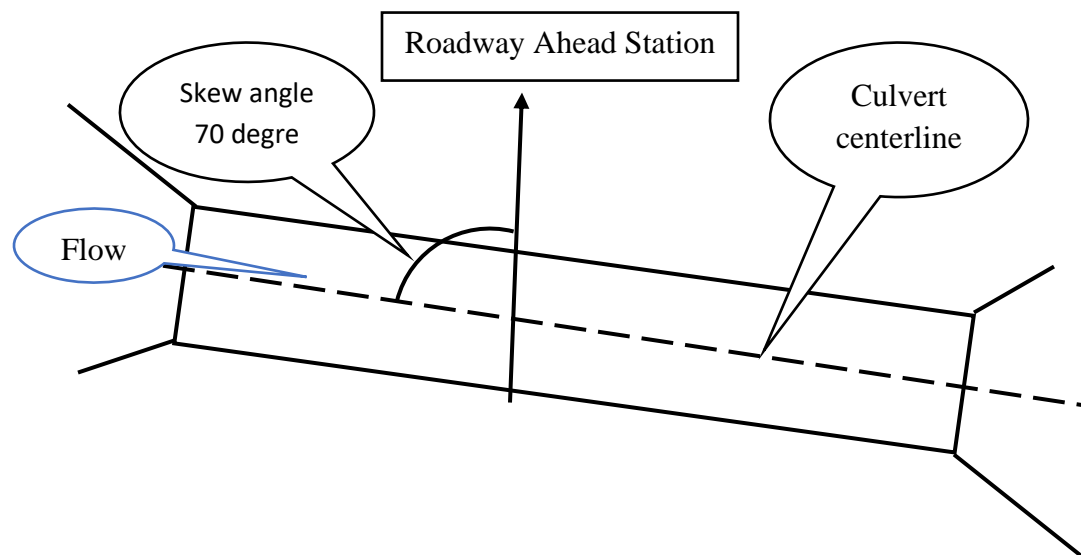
Plan view of 10 by 10-foot Concrete Box Culvert (CBC)
